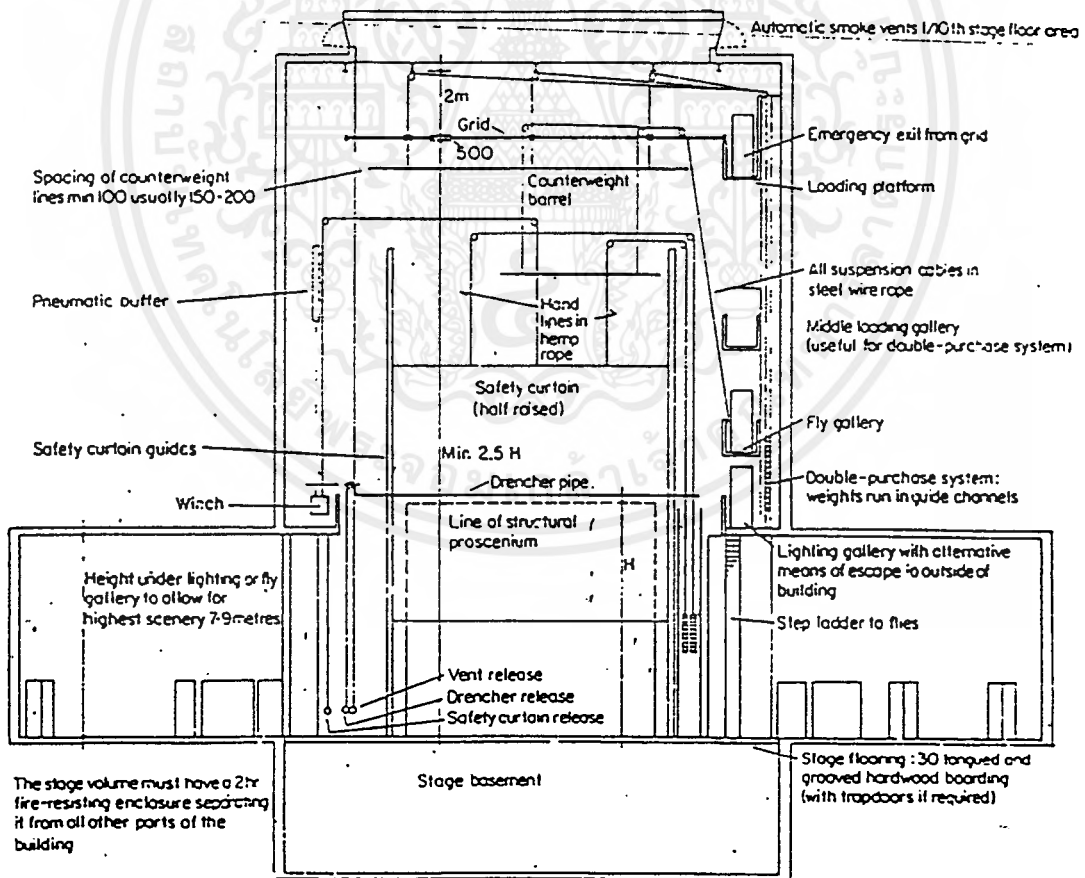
Typical section through stage and fly tower looking towards auditorium
